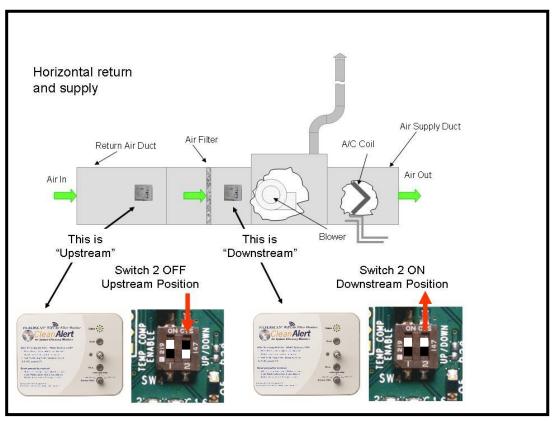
Installation on HVAC systems with horizontal return and supply ducts
